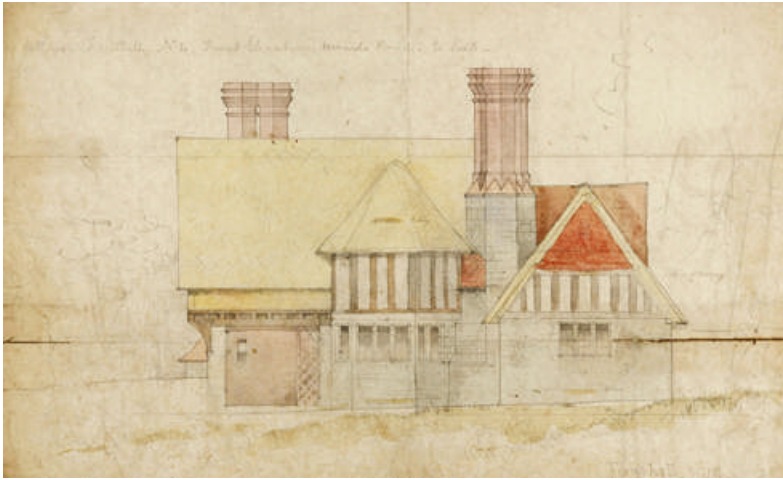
George Devey, 'Design for cottage at Fonthill Gifford', front elevation. 9854, RIBA Collections.
